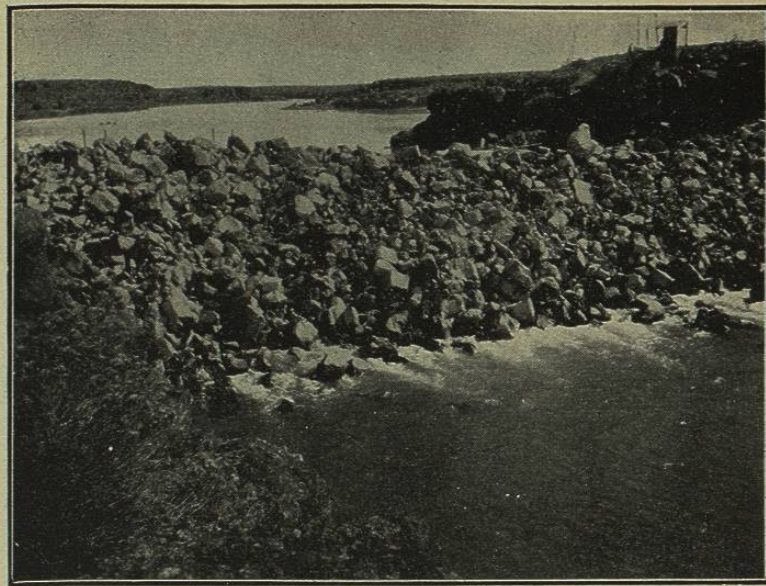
MILNER DAM, SNAKE RIVER, IDAHO. NORTH CHANNEL DAM BEFORE COMPLETION OF SHEET PILING. ABOUT 500 SECOND-FOOT IS PASSING THROUGH ROCK-FILL, UNDER HEAD OF 13 FEET.
